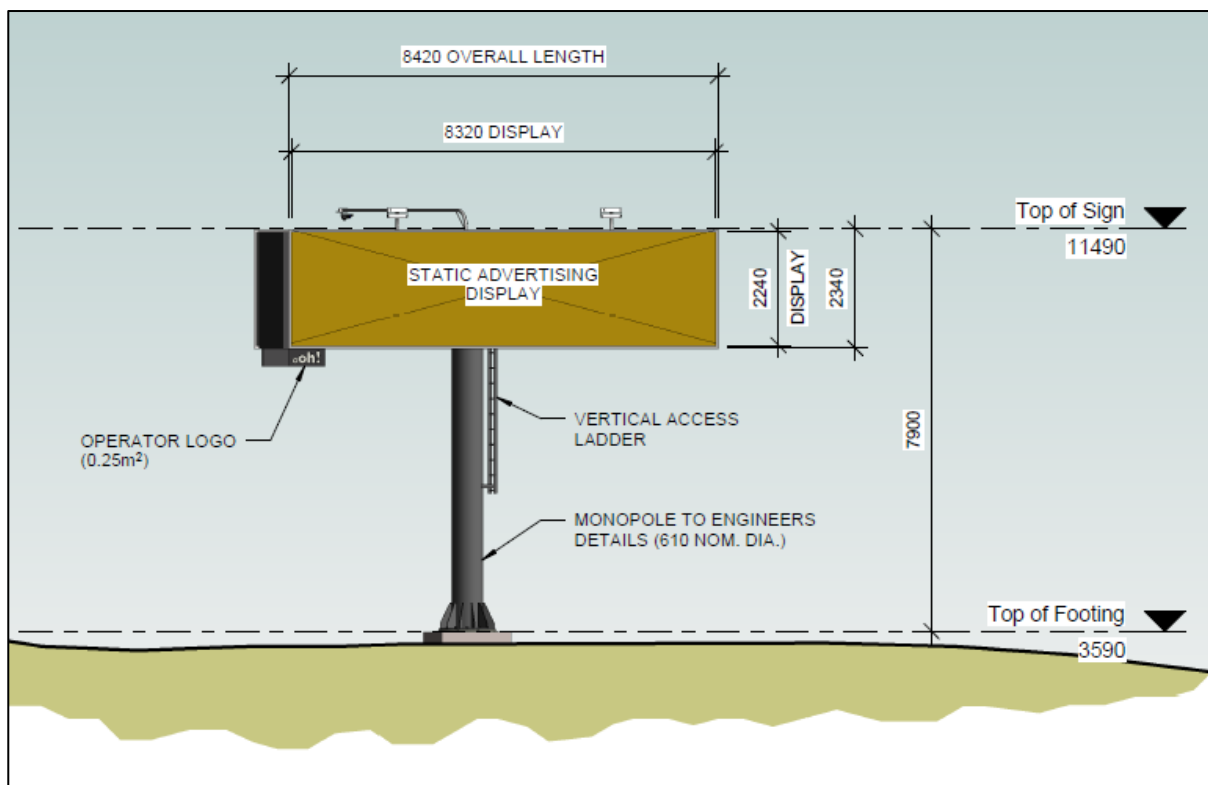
Proposed Static Sign Elevation. Source: oOh!media
